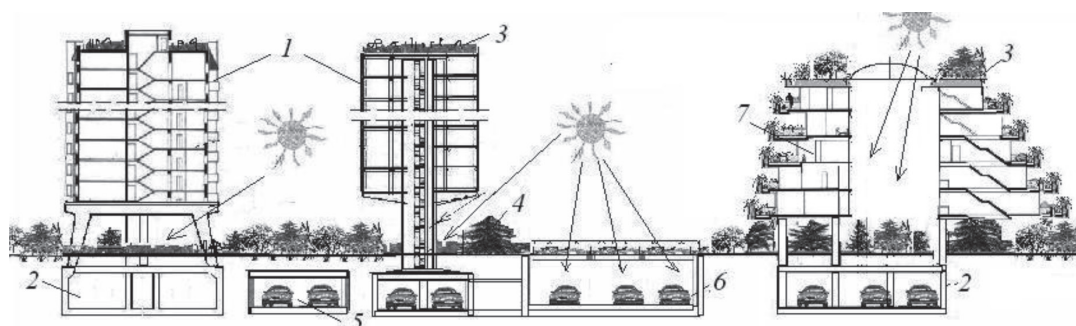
Scheme of “zero” ecocity with ecobuildings: 1 – overground buildings; 2 – underground parts of buildings; 3 – green roof; 4 – soil-vegetable layer; 5 – underground structures; 6 – underground street with sun lighting; 7 – “green hill”
